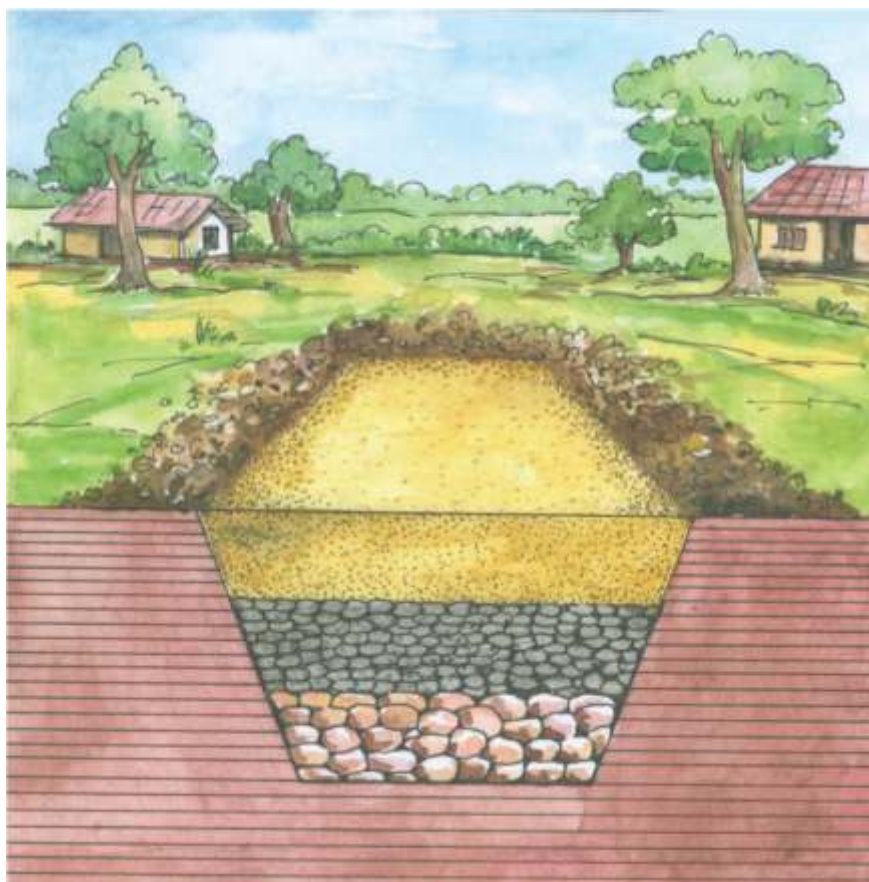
Construction of Soak Pits, Cross section of the soak pit with rural setting
